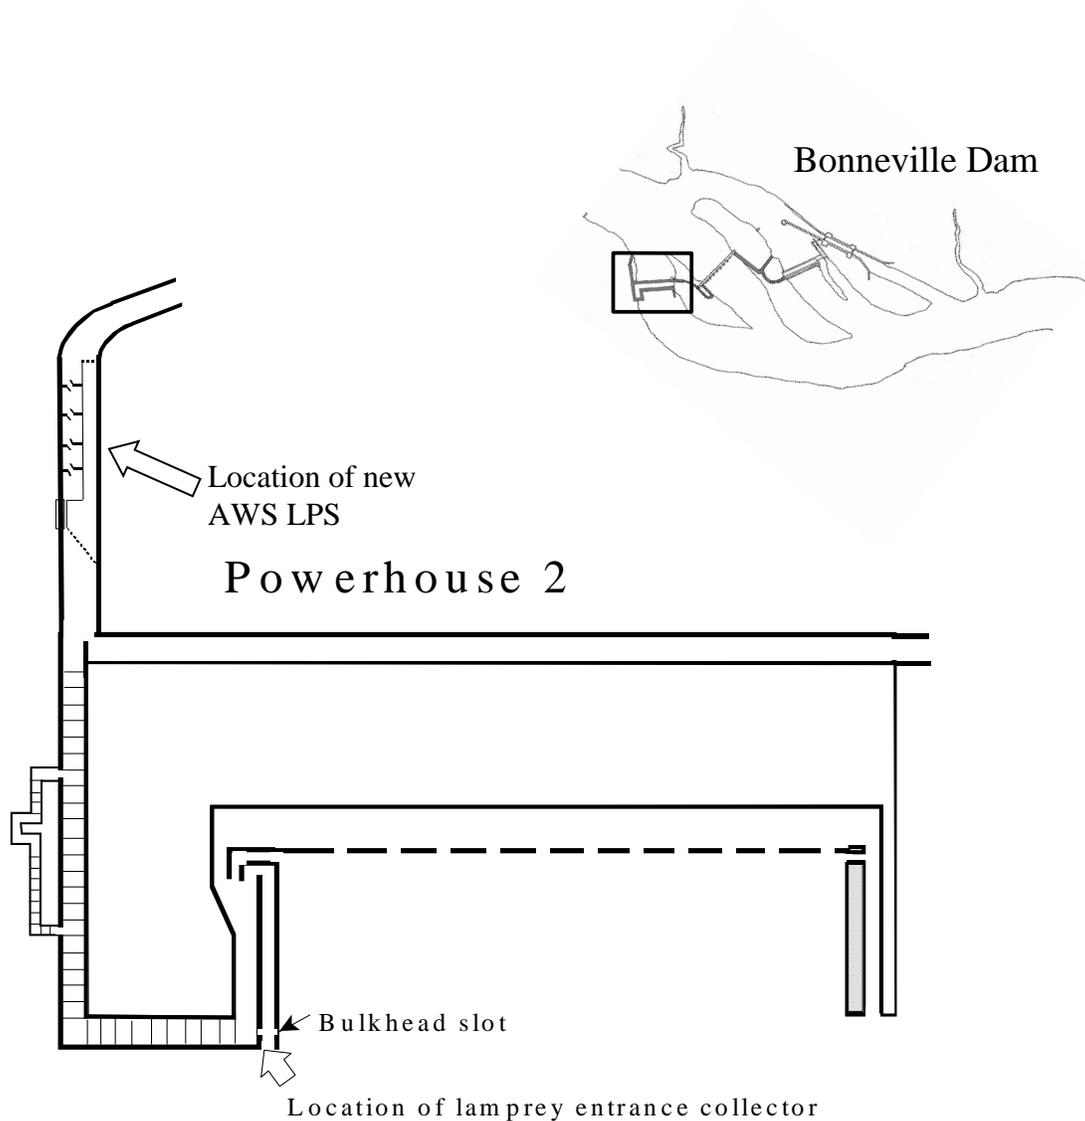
Plan view showing locations of the new AWS LPS and existing entrance collector at the Washington Shore fishway.
